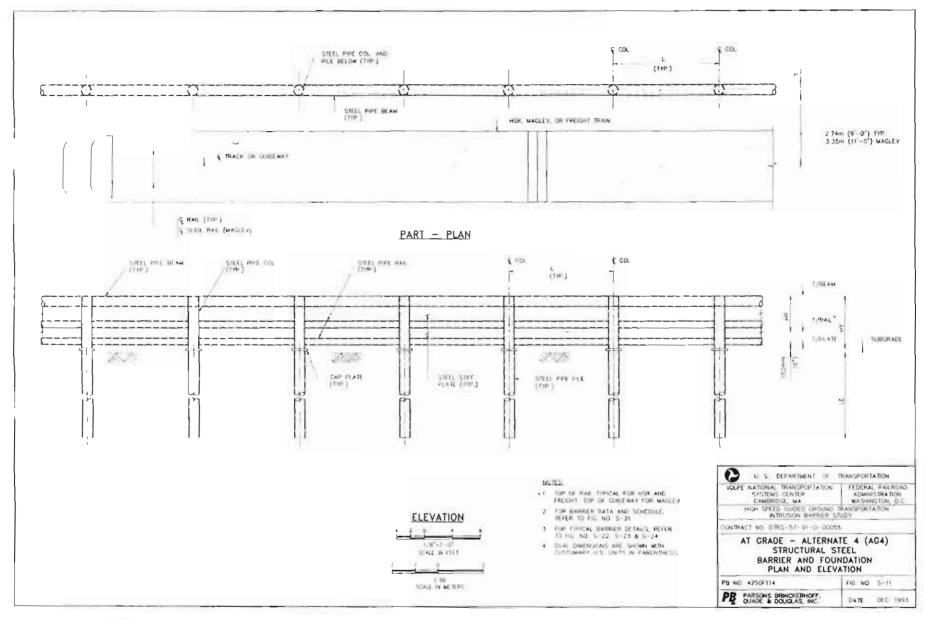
AT GRADE ALTERNATE 4: STRUCTURAL STEEL POST, RAILING AND FOUNDATION - PLAN AND ELEVATION
